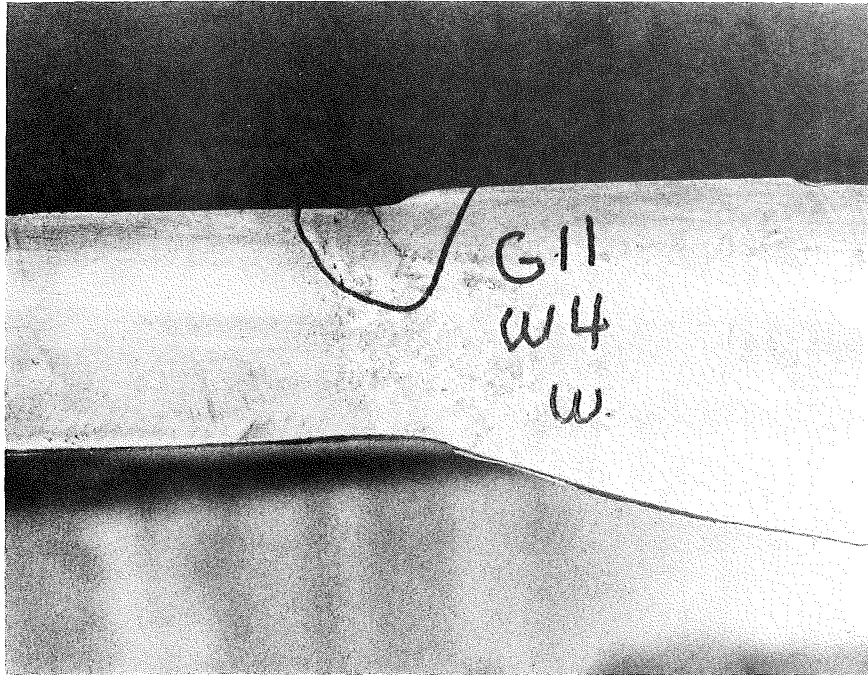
Crack in flange tip of northbound girder G11 W4A . Crack in electroslag weld near reinforcement.
